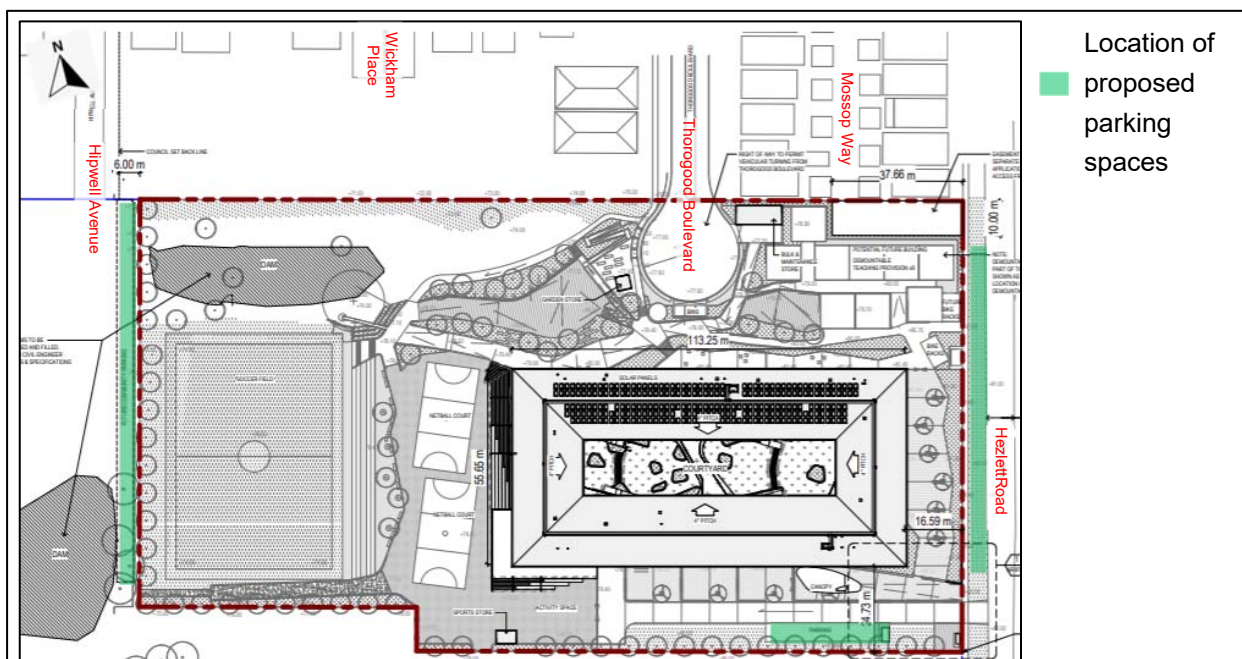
| Approved site layout (Source: Applicant's EIS 2017)
